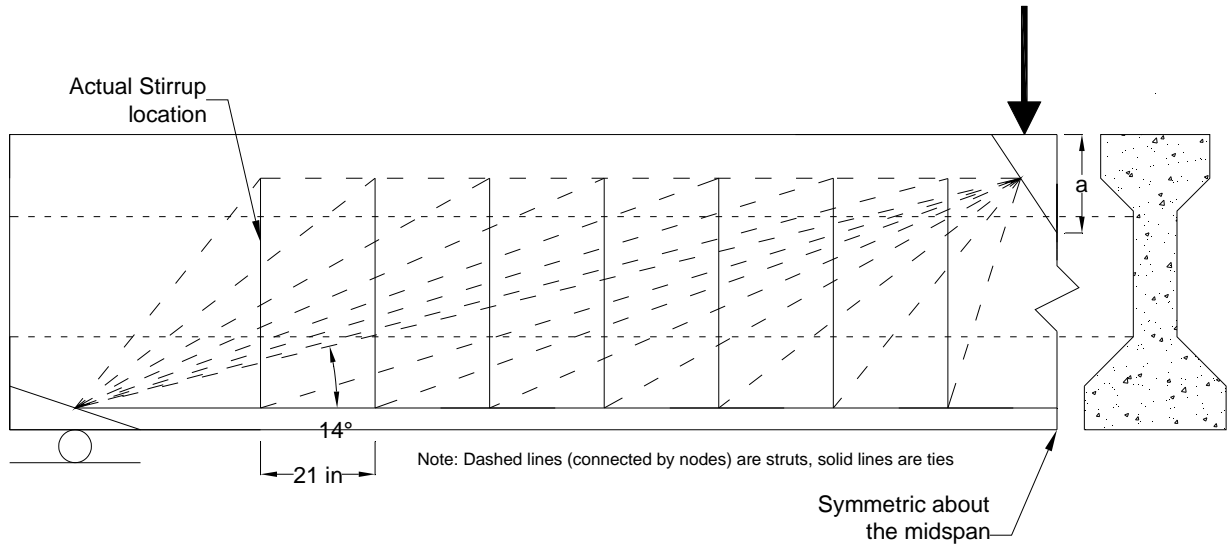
Strut and Tie Model for Half of the Beam (no deck)
